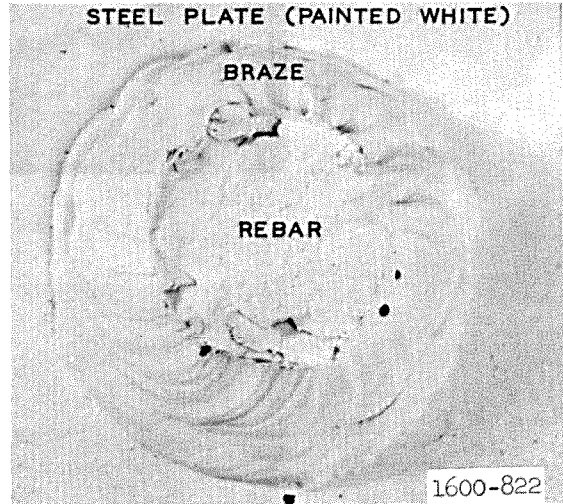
Posttest view showing concrete failure that occurred on brazed side of steel plate, Test 209 (concrete-encased bar).
